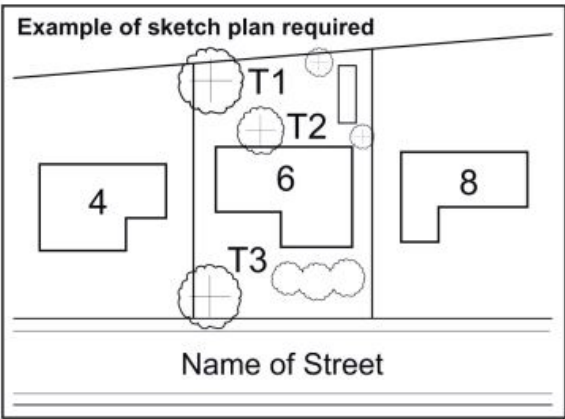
Sketch plan example (C) Malvern Hills Borough Council
